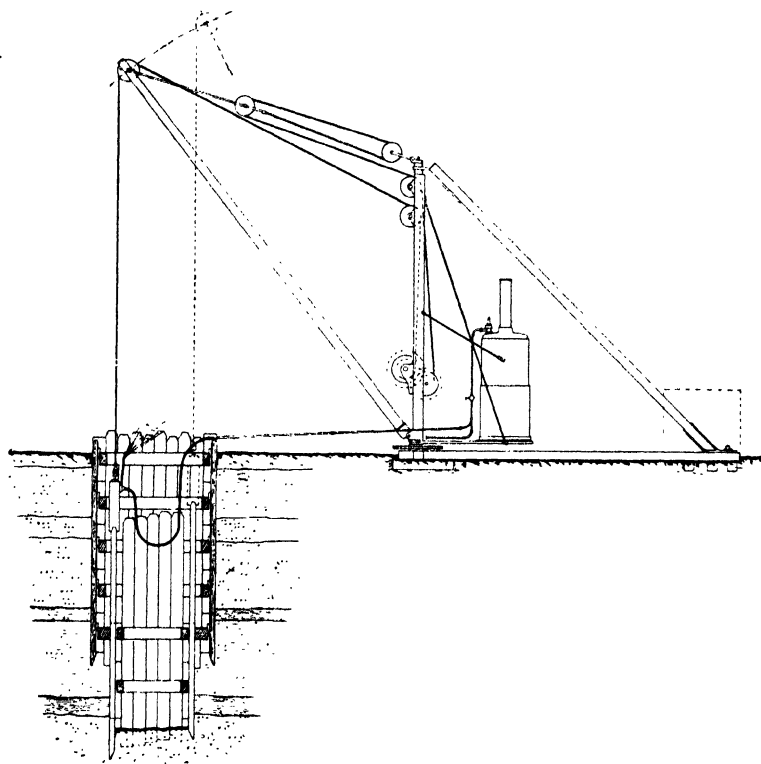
Driving Runners with a Double-acting Steam Hammer.
